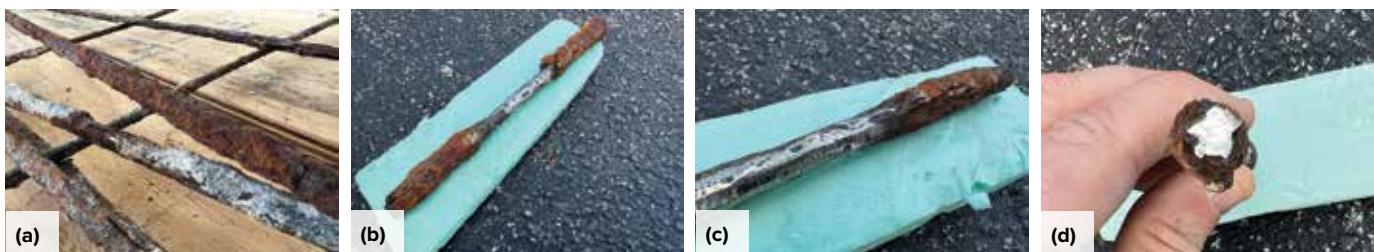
Examples of: (a) chloride-induced corrosion and associated rust on reinforcing steel bars; (b) bar section with corrosion products (rust) removed from the middle portion with a grinding wheel; (c) different colored expansive corrosion products and pits with corrosion products; and (d) cross section at the end of the bar showing corrosion in the form of significant deterioration and section loss of the bar
